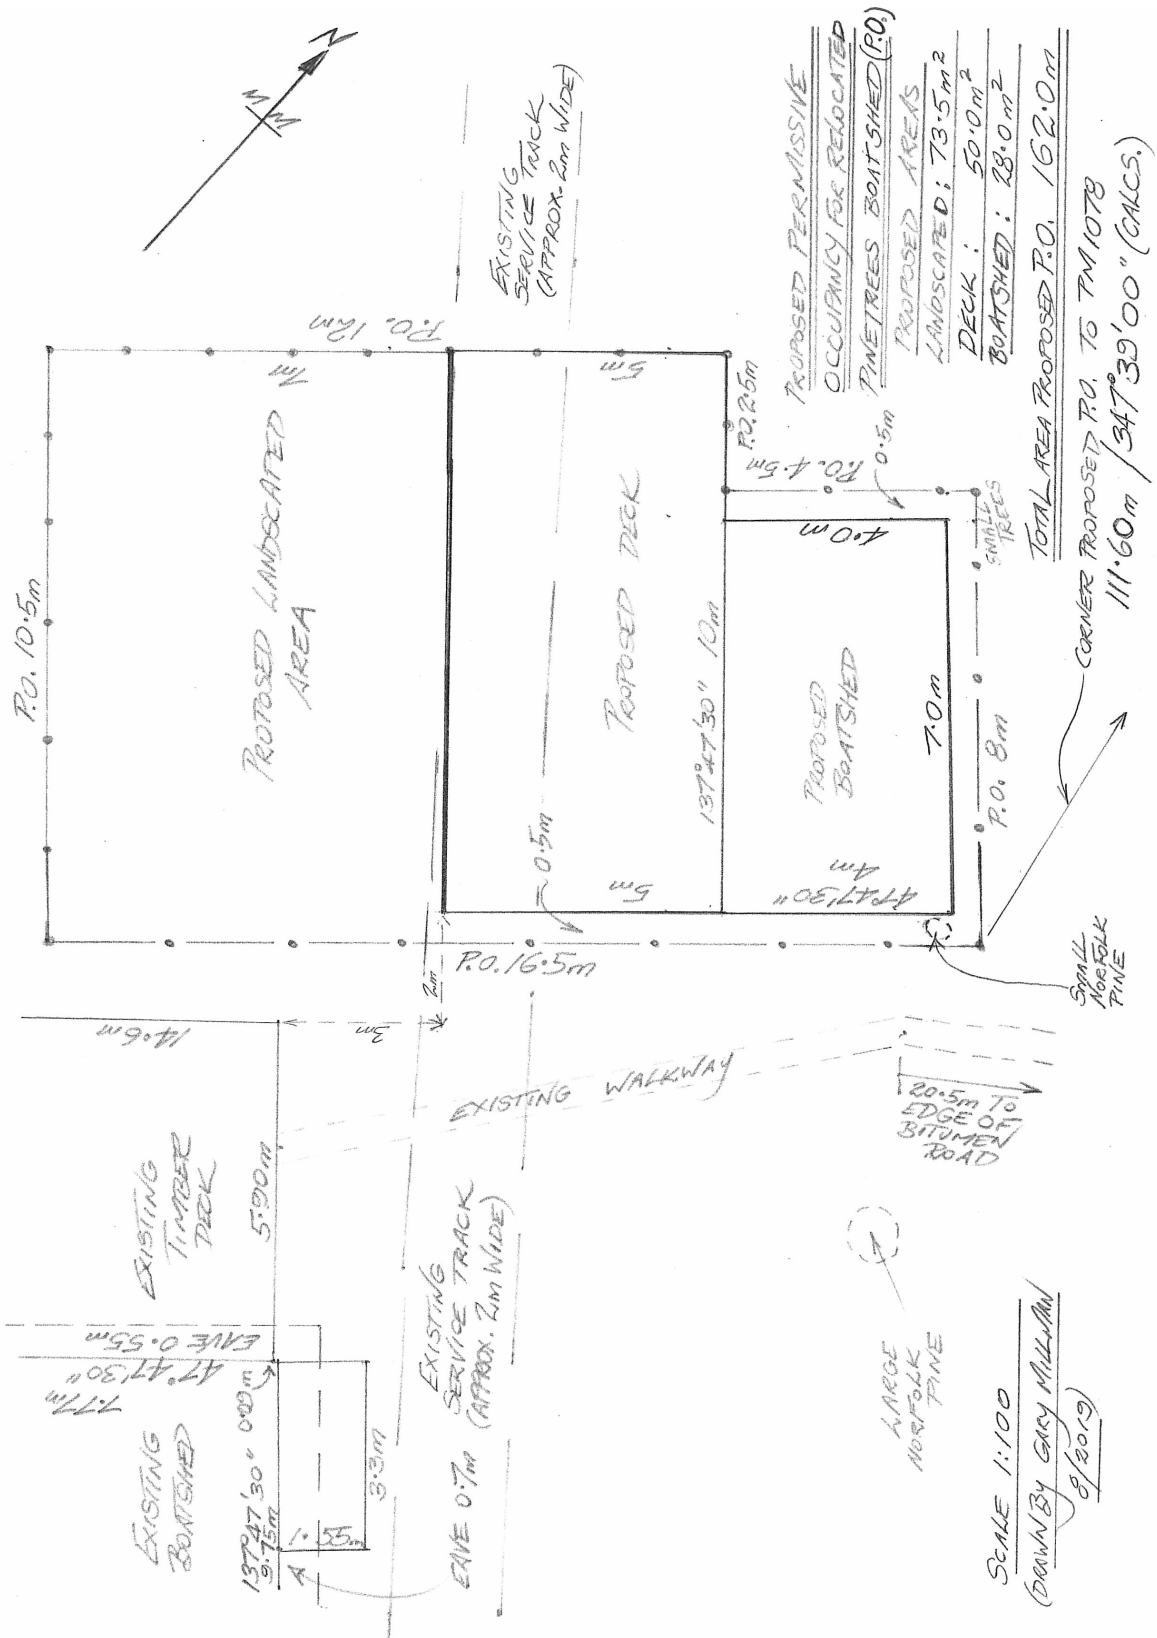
Plan view detailing Permissive Occupancy area and indicative location of proposed structures.
